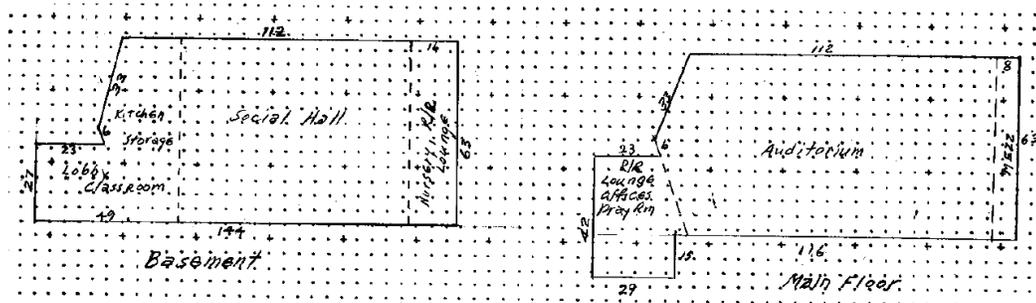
Floor plans of 1709 Alcatraz Avenue. East is up.
